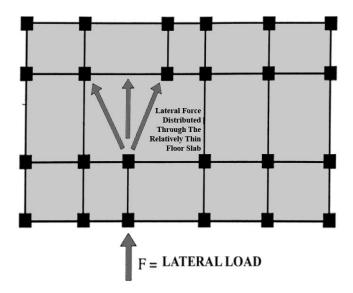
Non-Continuous Beam in a Floor Plan (Ozmen and Unay, 2007)
